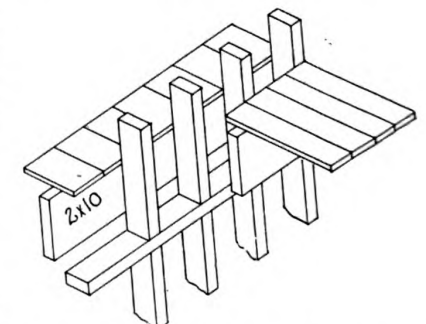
Construction when second floor joists run parallel to partition. Studs should be set on a cap, and not on the floor joists as shown in Fig. 1. Joists should be kept 2 in. from studs.
